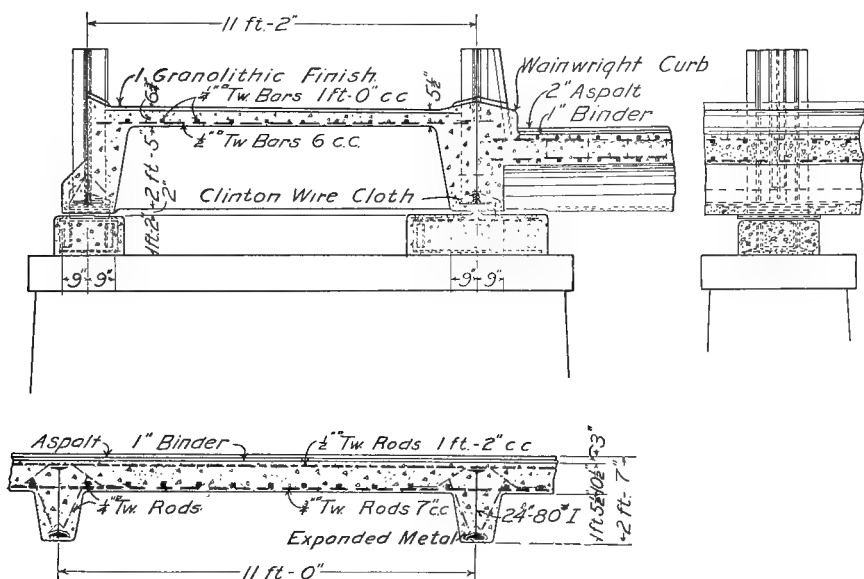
DETAILS OF FLOOR CONSTRUCTION, FIRST AVENUE VIADUCT.
